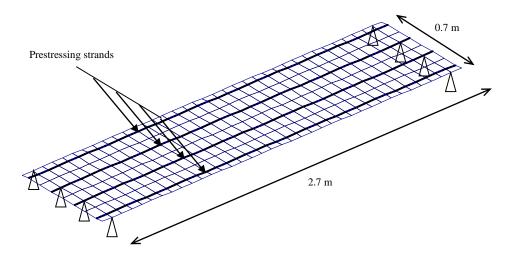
Schematic drawing of the prestressed concrete panel for finite element model
